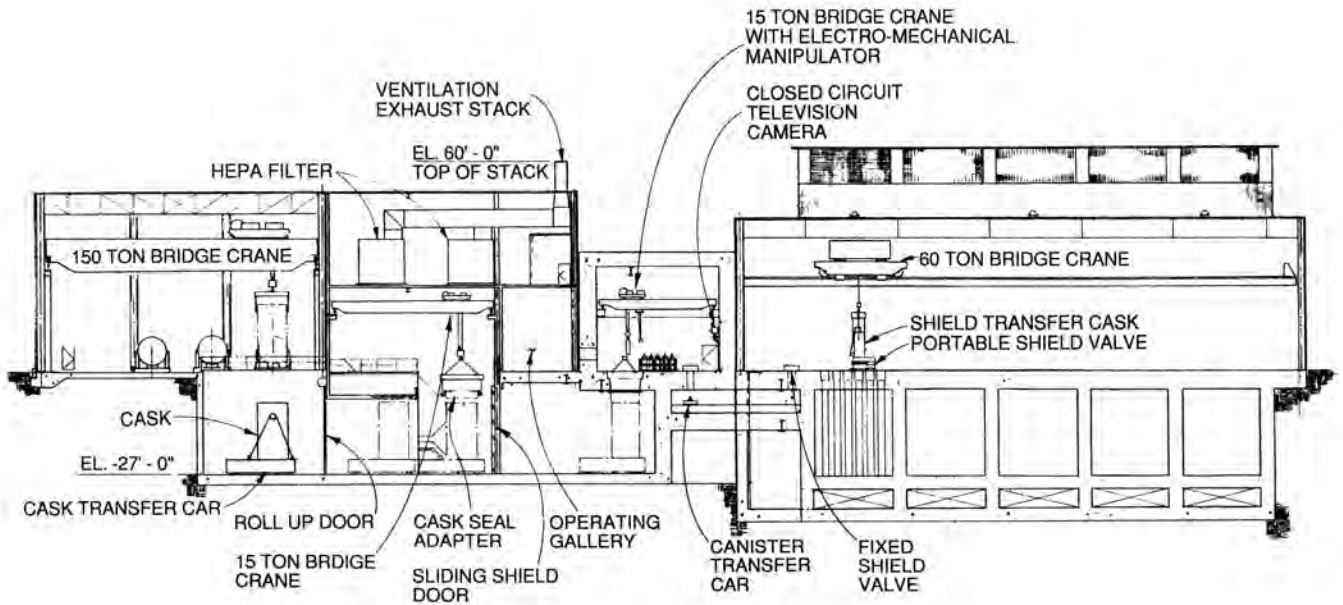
Section View of the Vitrified HLW Storage Facility.
